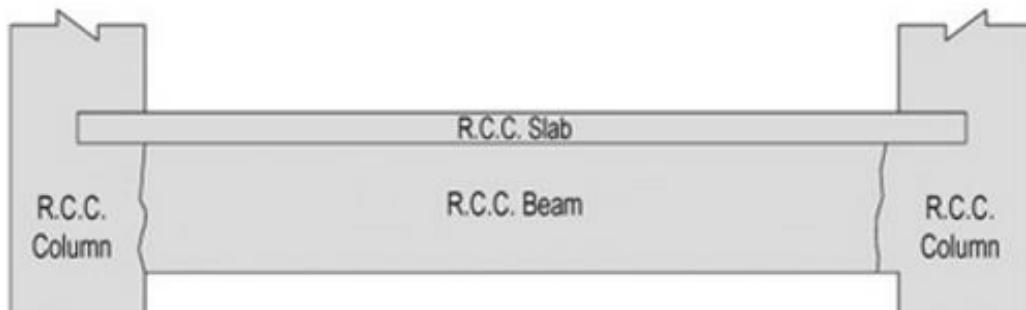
Sliding cracks in RC beams (Jaydutt Tailor, 2017).
